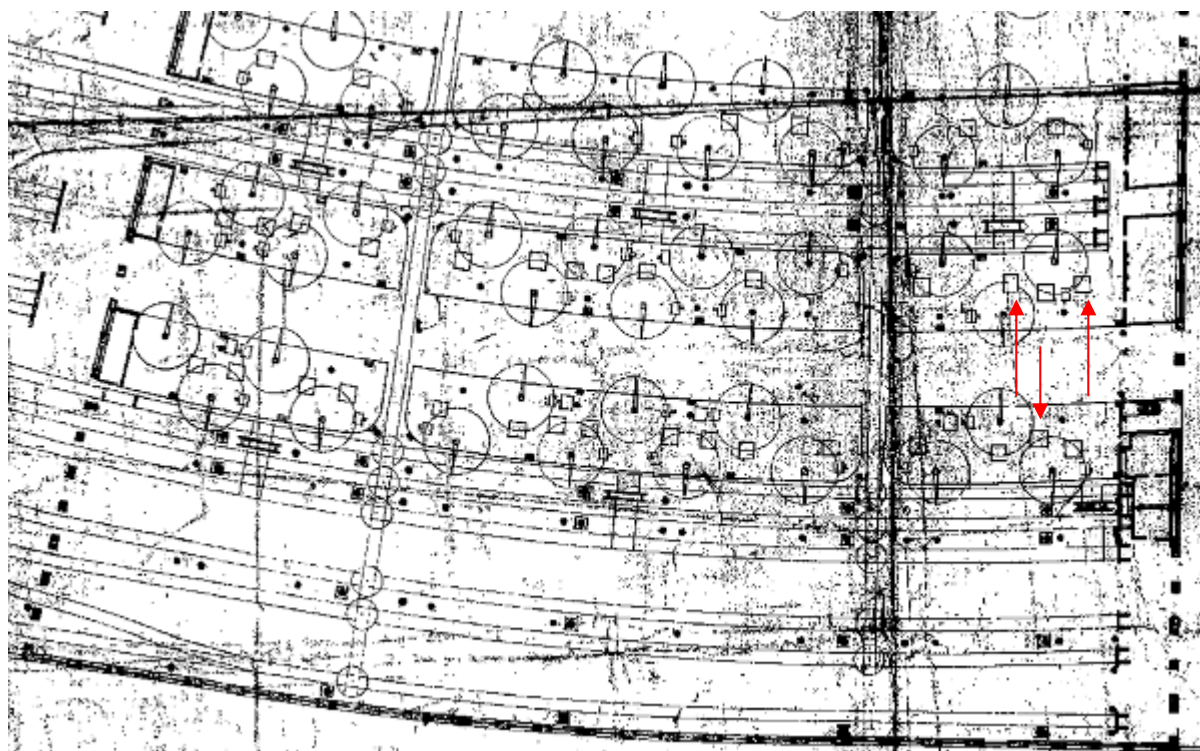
1866 NER ground floor plan of Goods Station, showing hatches in platforms either side of the train tracks, providing access to the undercroft
